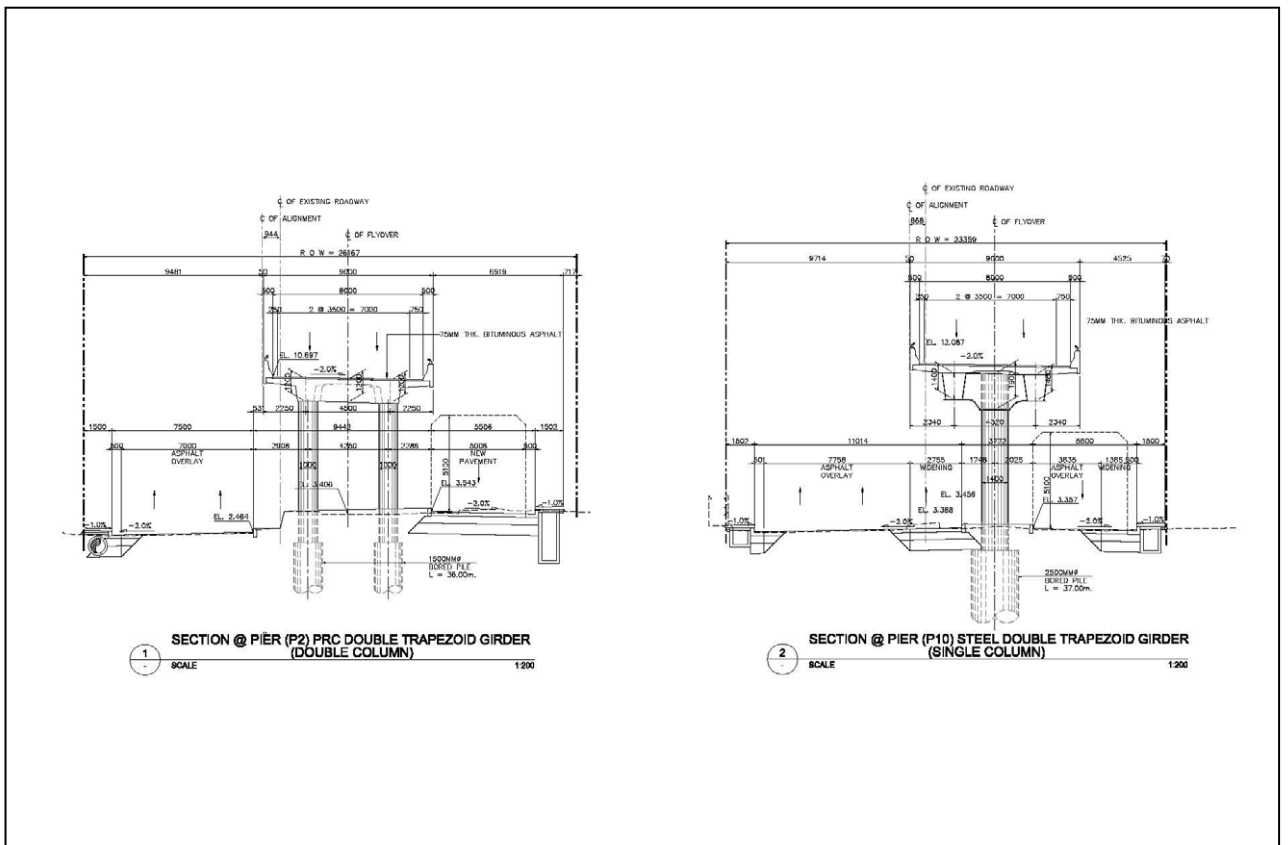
TYPICAL CROSS SECTION (GEBANG)
